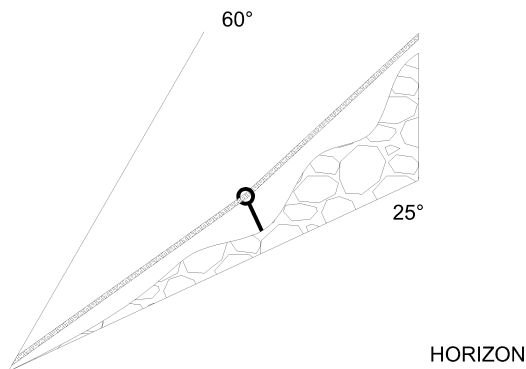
Sloping (steep angle) overground section (between 25° and 60°)
